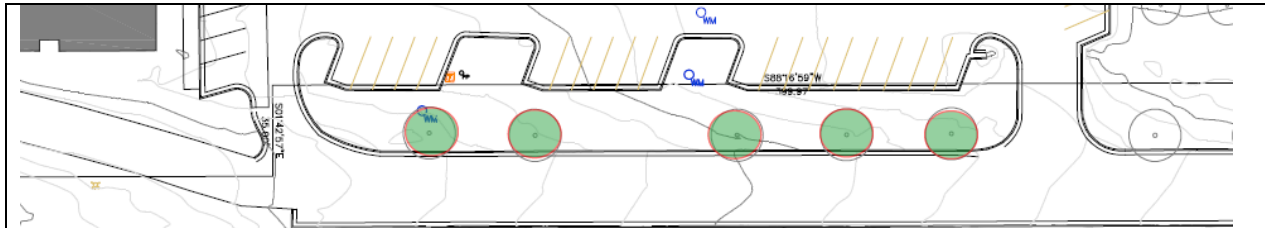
Proposed Landscape Plan – Street trees are located in public ROW
